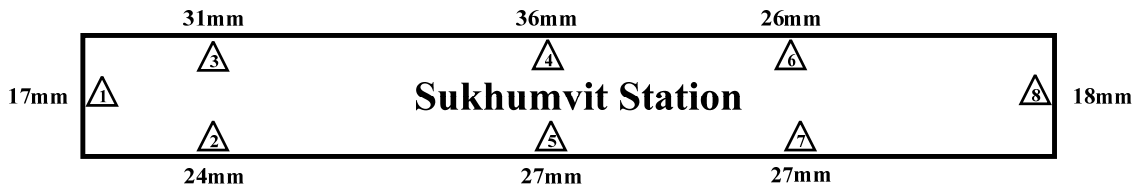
Maximum horizontal movement of D-wall after stage 4 excavation
